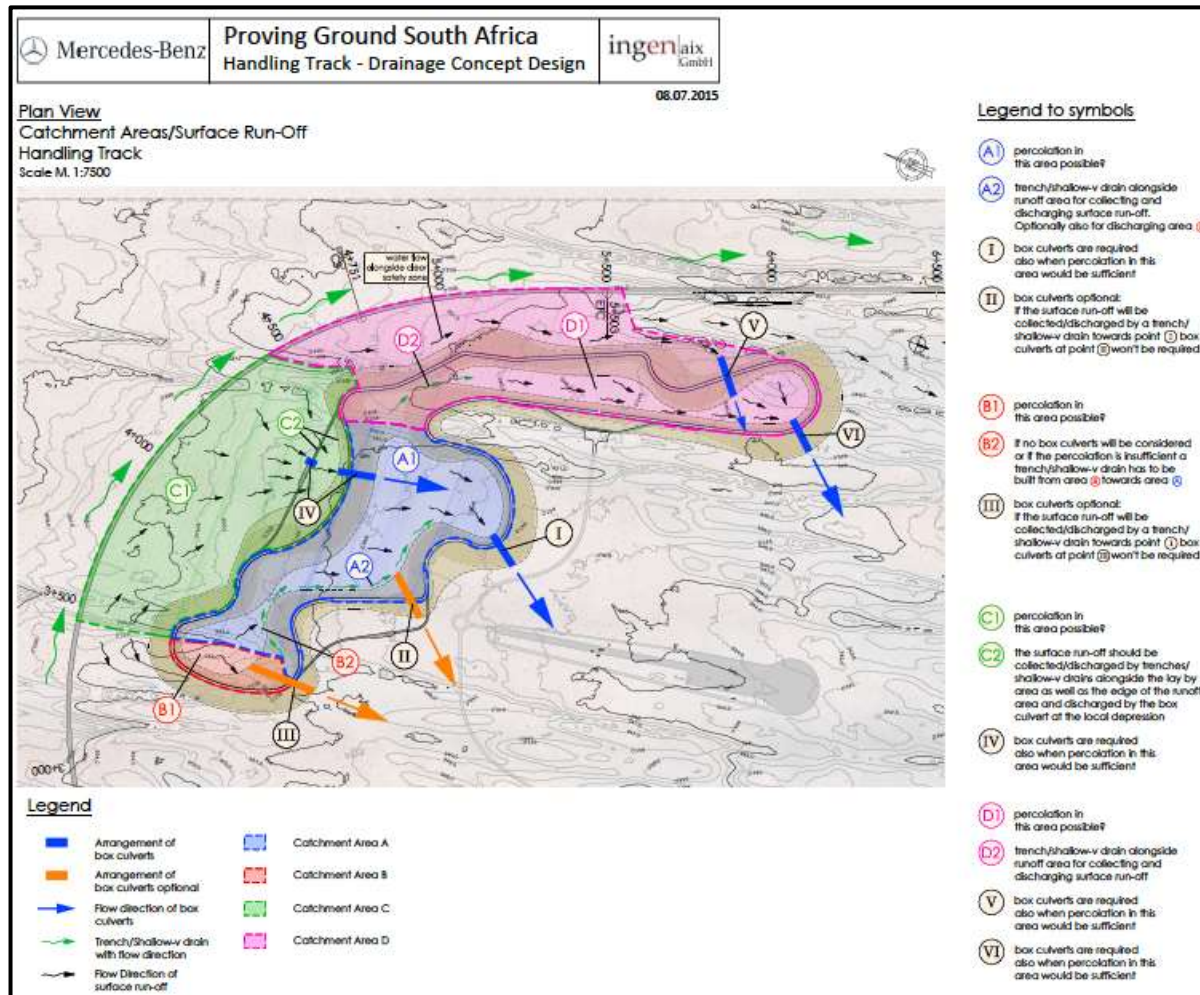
Handling track – catchment areas and surface runoff drainage (IngenAix, 2015)
